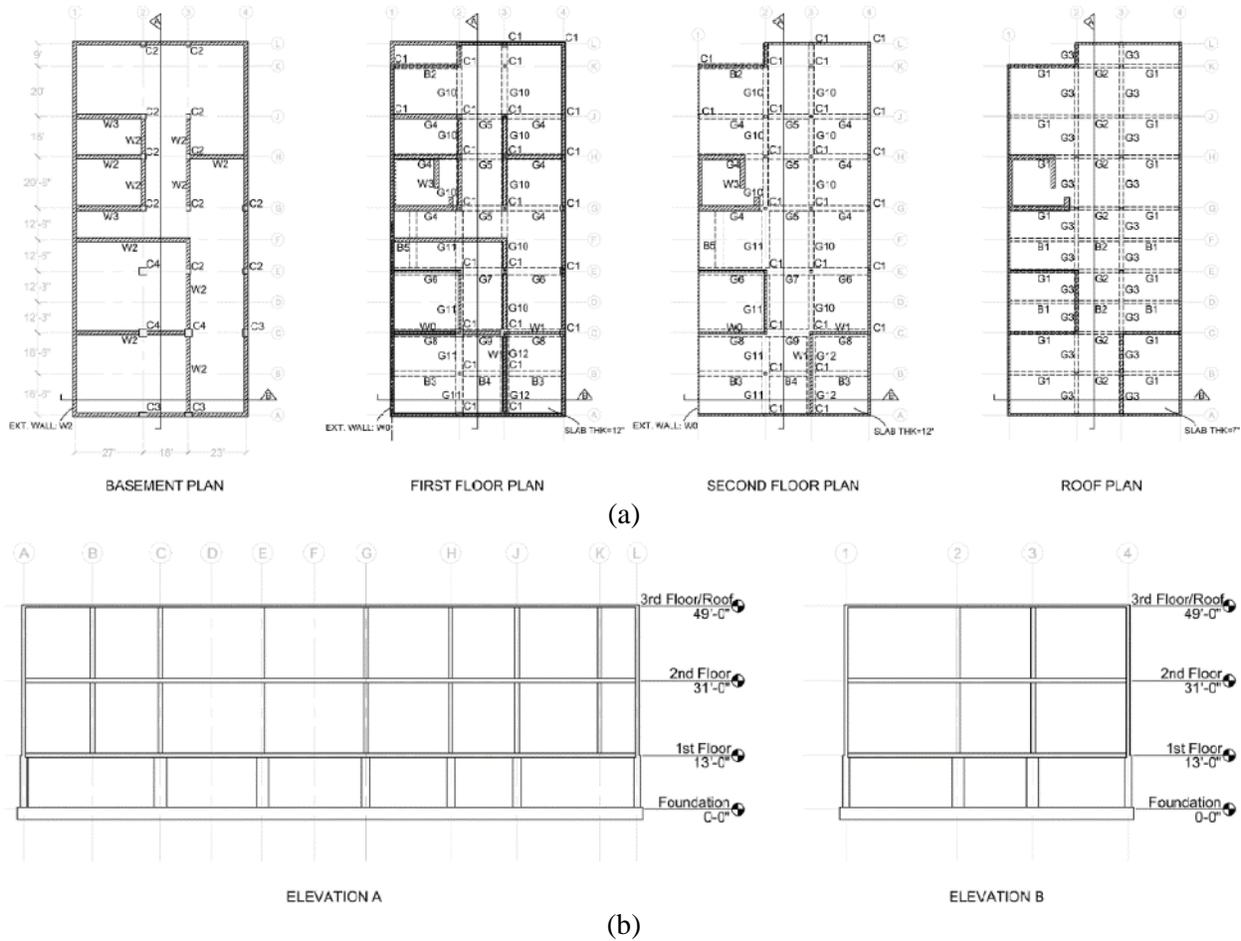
Structural plans for the realistic auxiliary building model: a) plan view, and b) elevation
